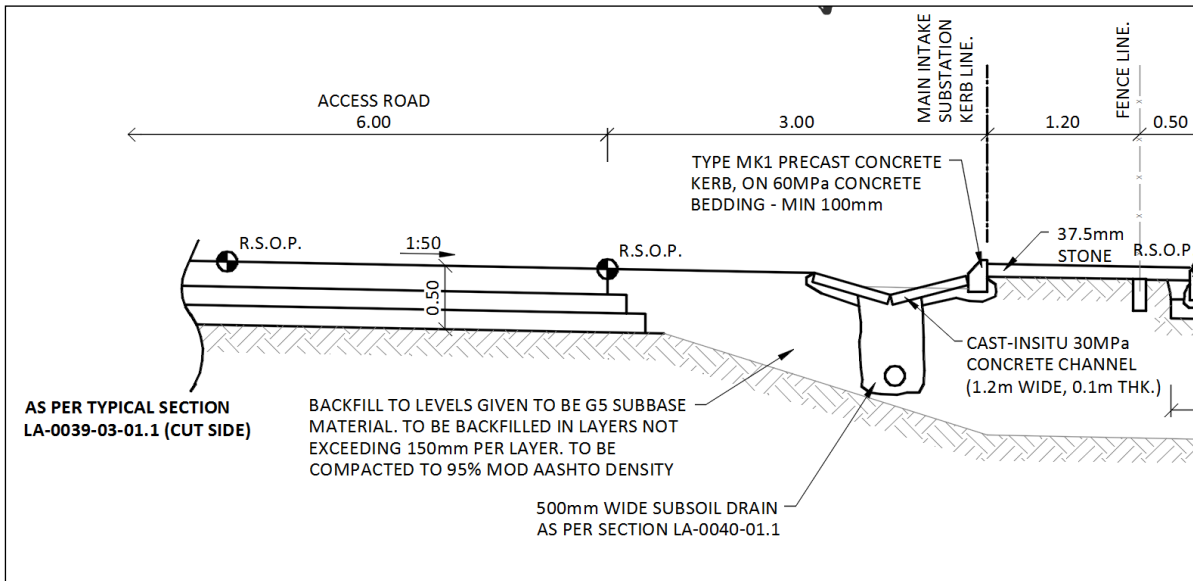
Typical Cast In-Situ Concrete Channel Detail
